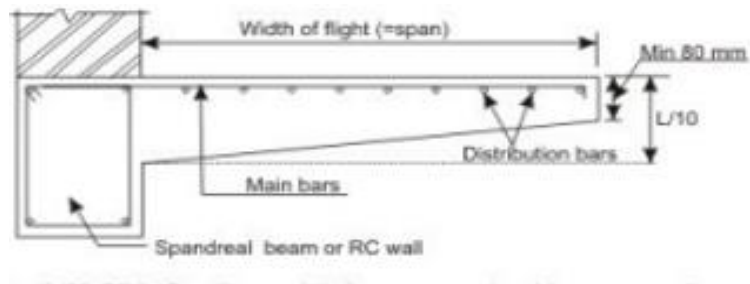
Cantilever slabs from a spandrel beam or wall
